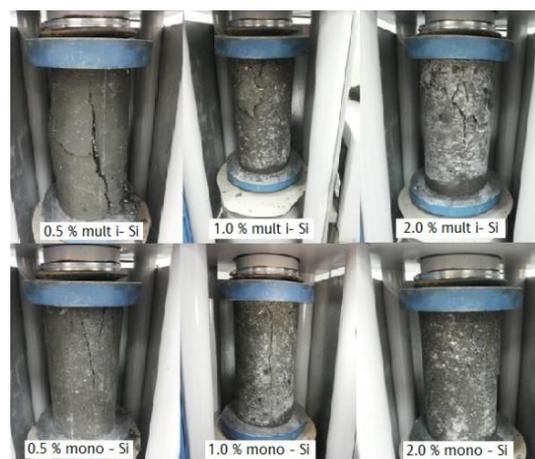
Failure shape in concrete specimens for both types of PV cells
